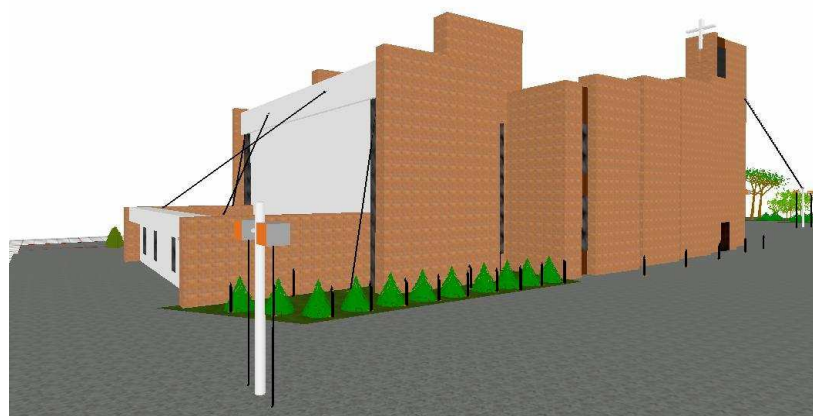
Spatial arrangement of luminaires – view of the northern and western facades
